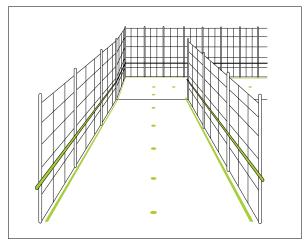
Ramp with photoluminescent discs, handrails & floor markings
